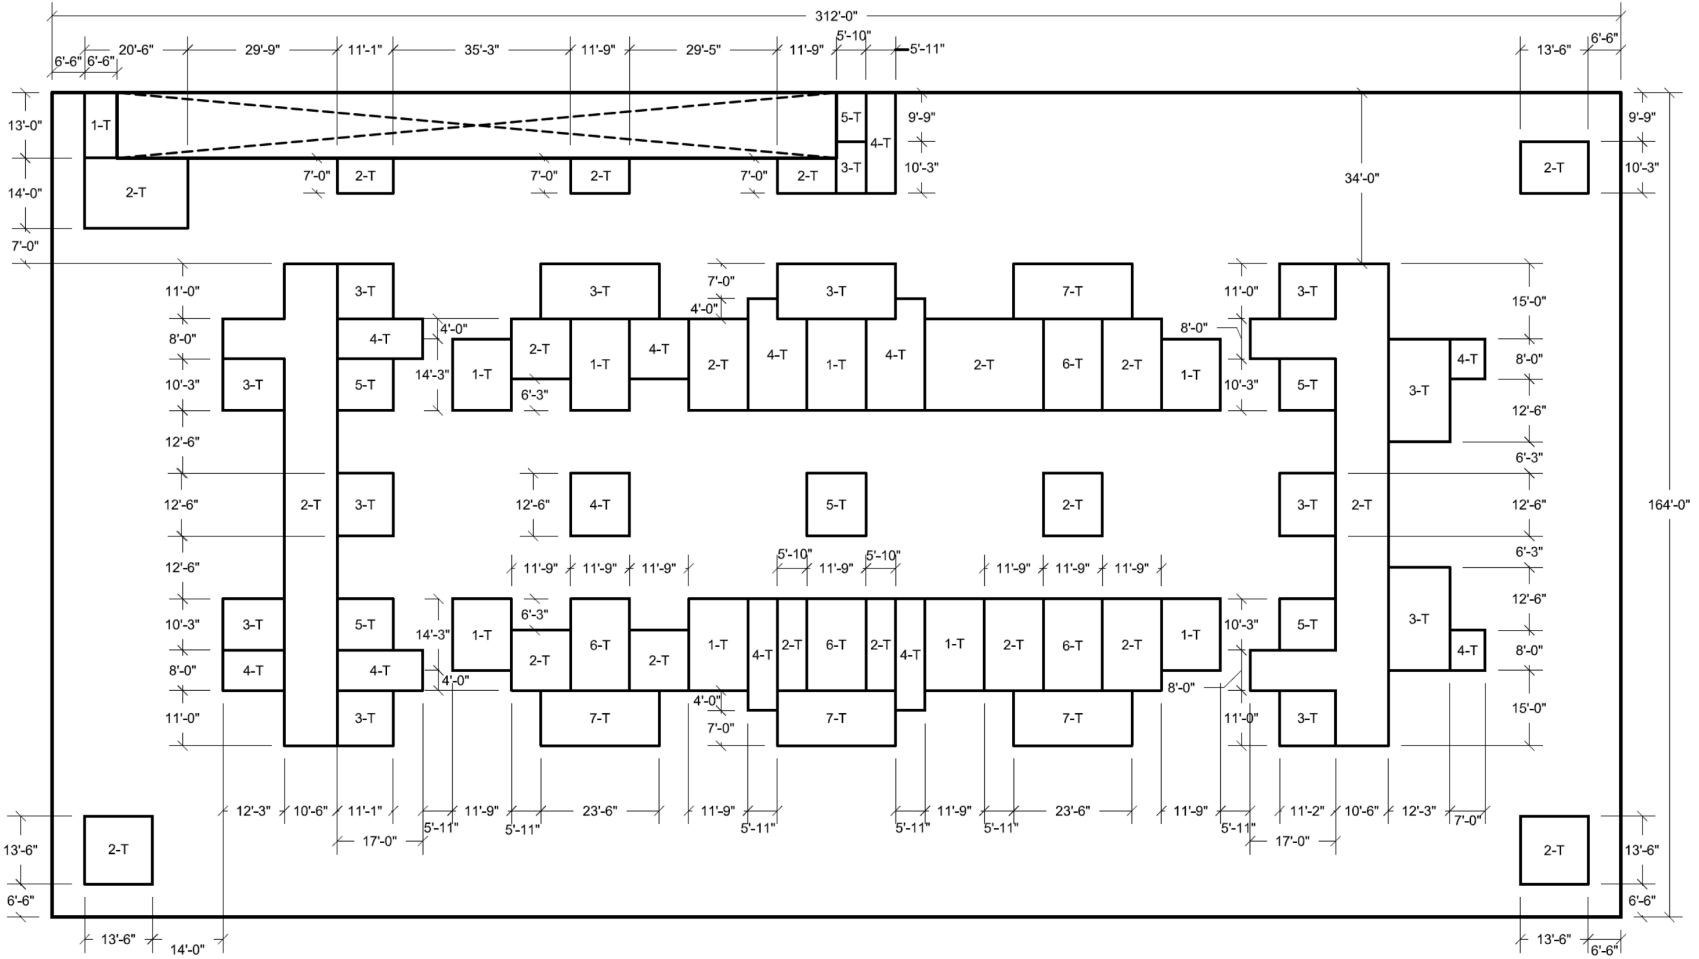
H.6-134A UHS Basin Foundation Mat Transverse Reinforcement Zones
